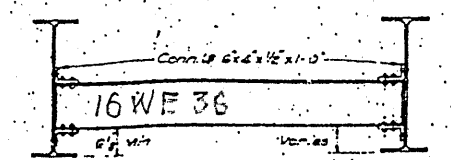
DETAIL OF CONNECTION OF D1 & D1A DIAPHRAGMS
